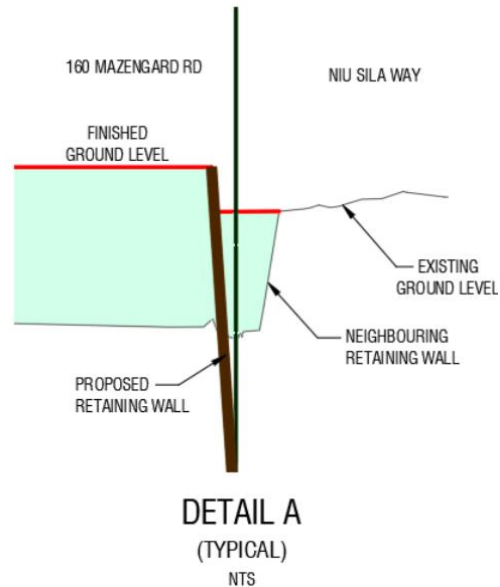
Proposed fill within Niu Sila Way (refer to Appendix D for further detail)
